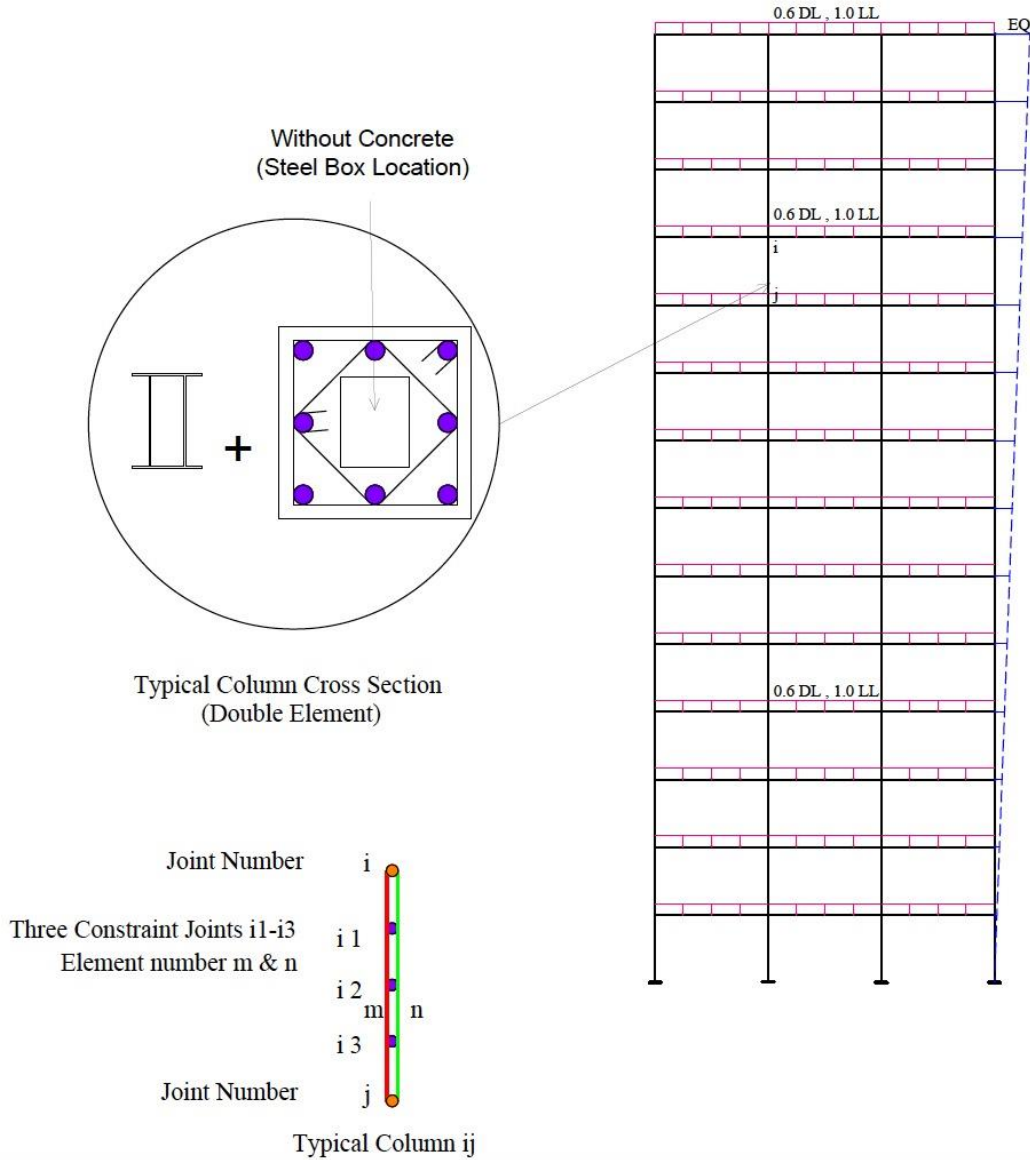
Typical Steel Frame (with or without “X” Bracing) with Composite Columns
